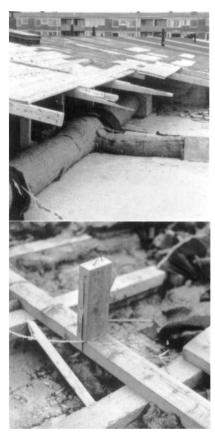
/6 Part of a damaged roof (top). Fixing of the posts to the secondary member laid on the concrete slab (bottom).
